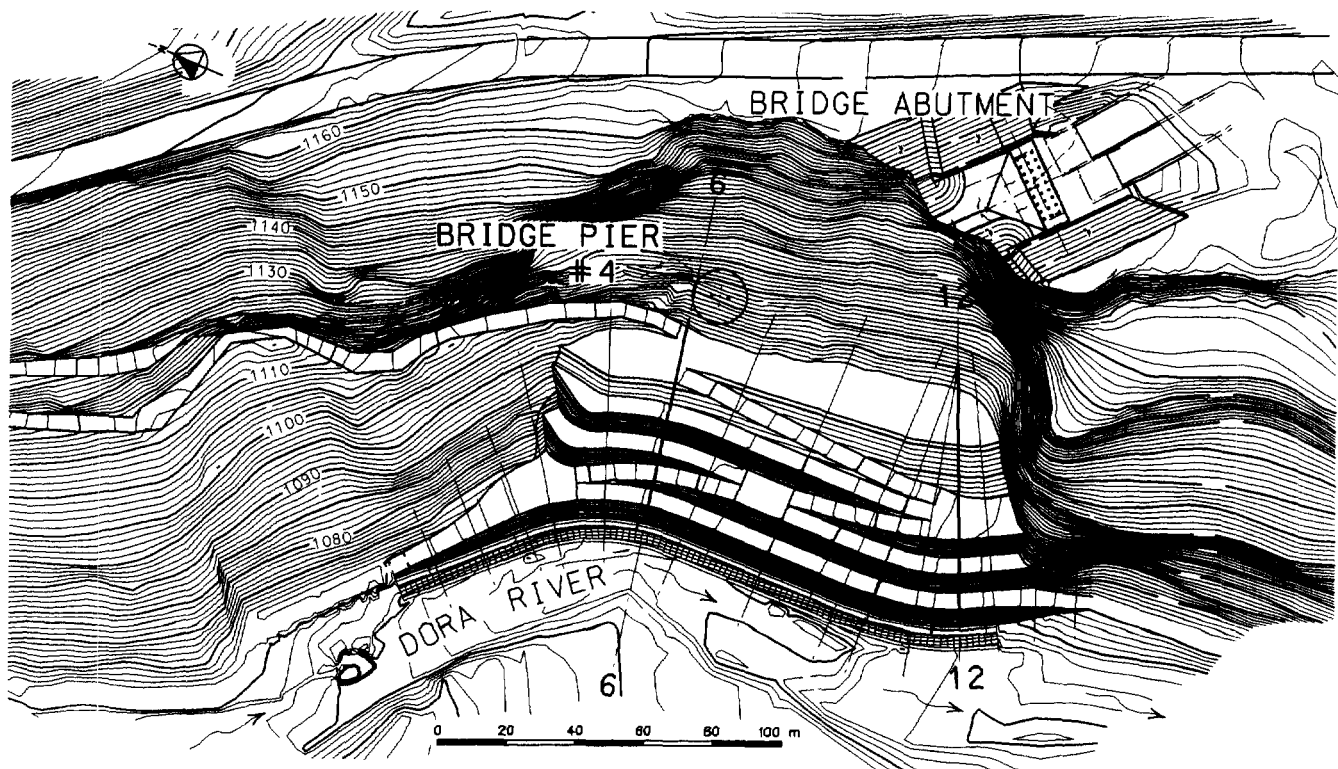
Plan of the Verrand High Reinforced Soil Structure
